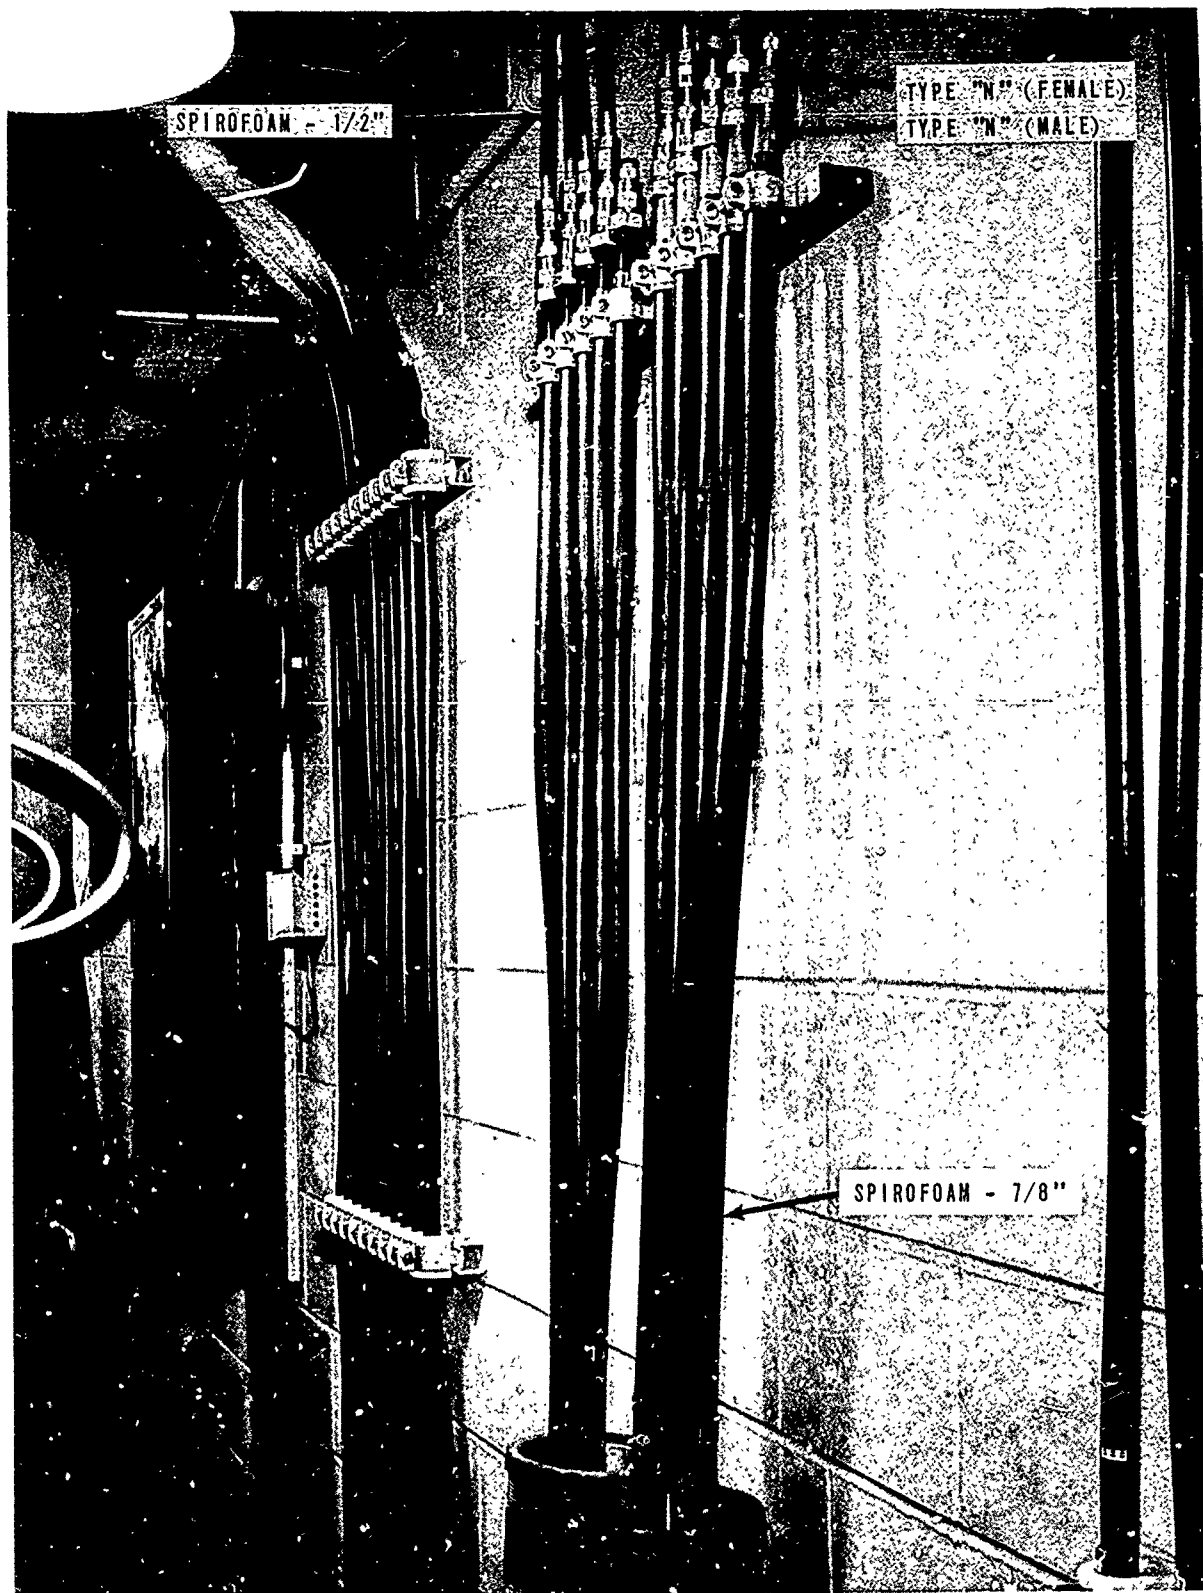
VIEW OF SPIROFOAM INSTALLATION IN THE FACILITY BUILDING
